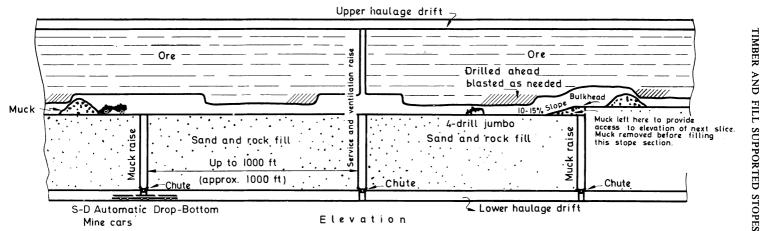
Ore haulage equipment operates on the surface of the sand and rock stope filling at this Canadian copper mine.⁽⁷⁾
